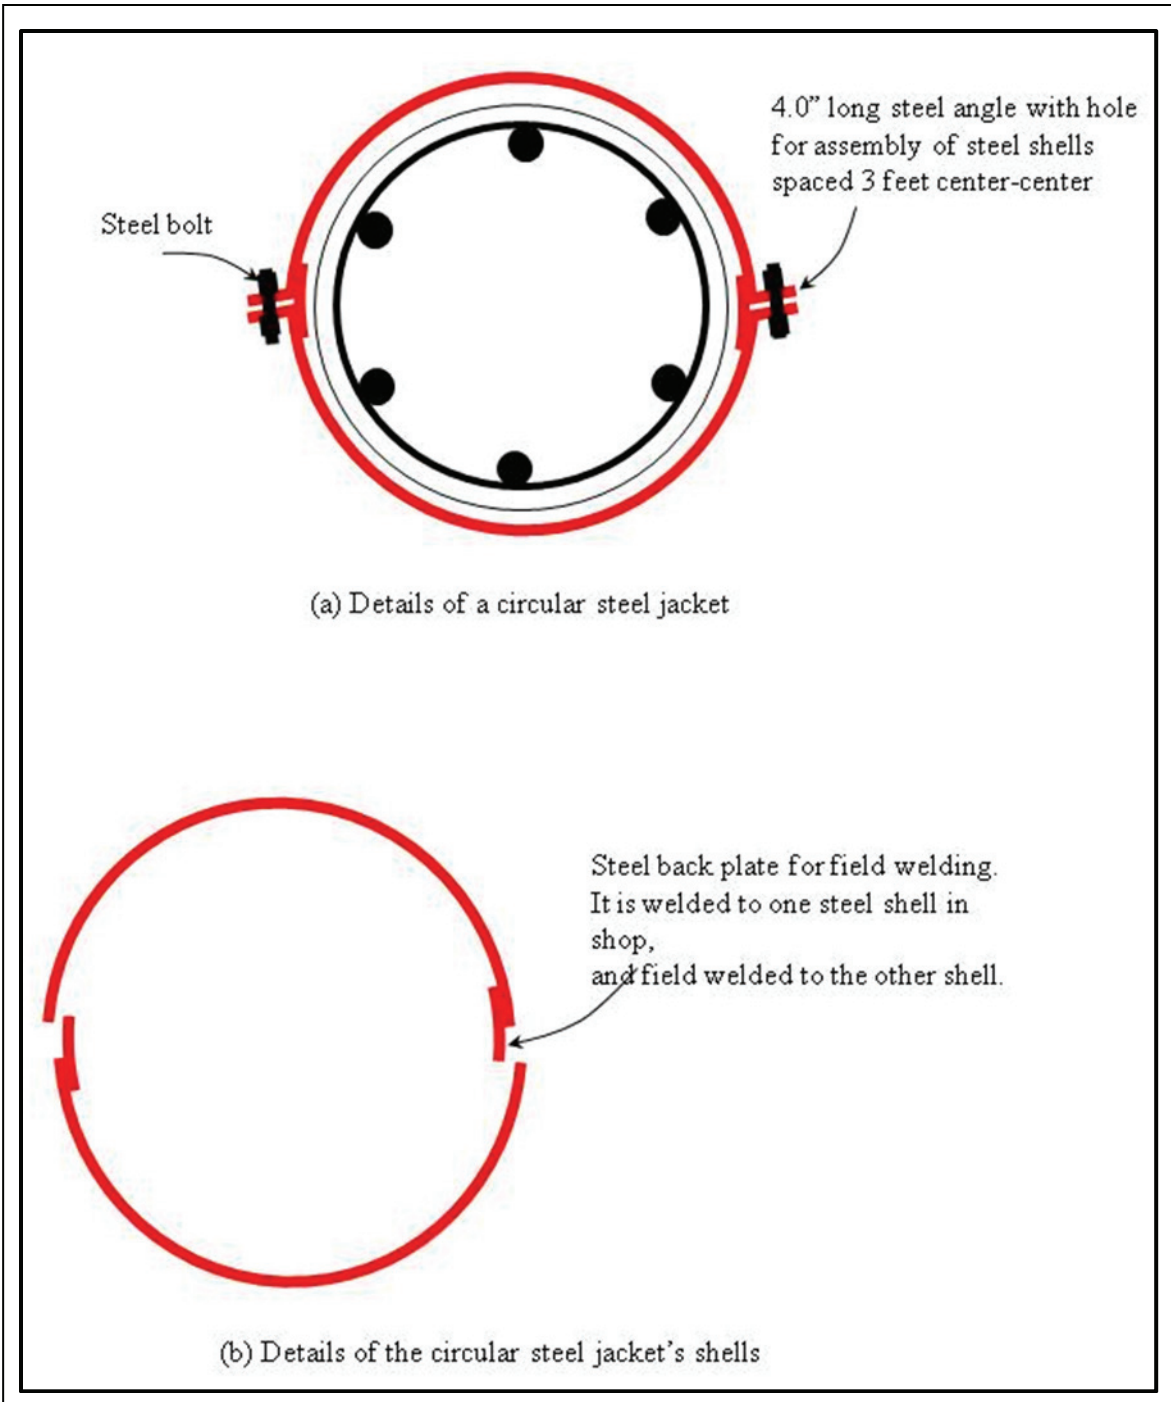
Details of a Circular Steel Jacket (Aboutaha, 1996)
